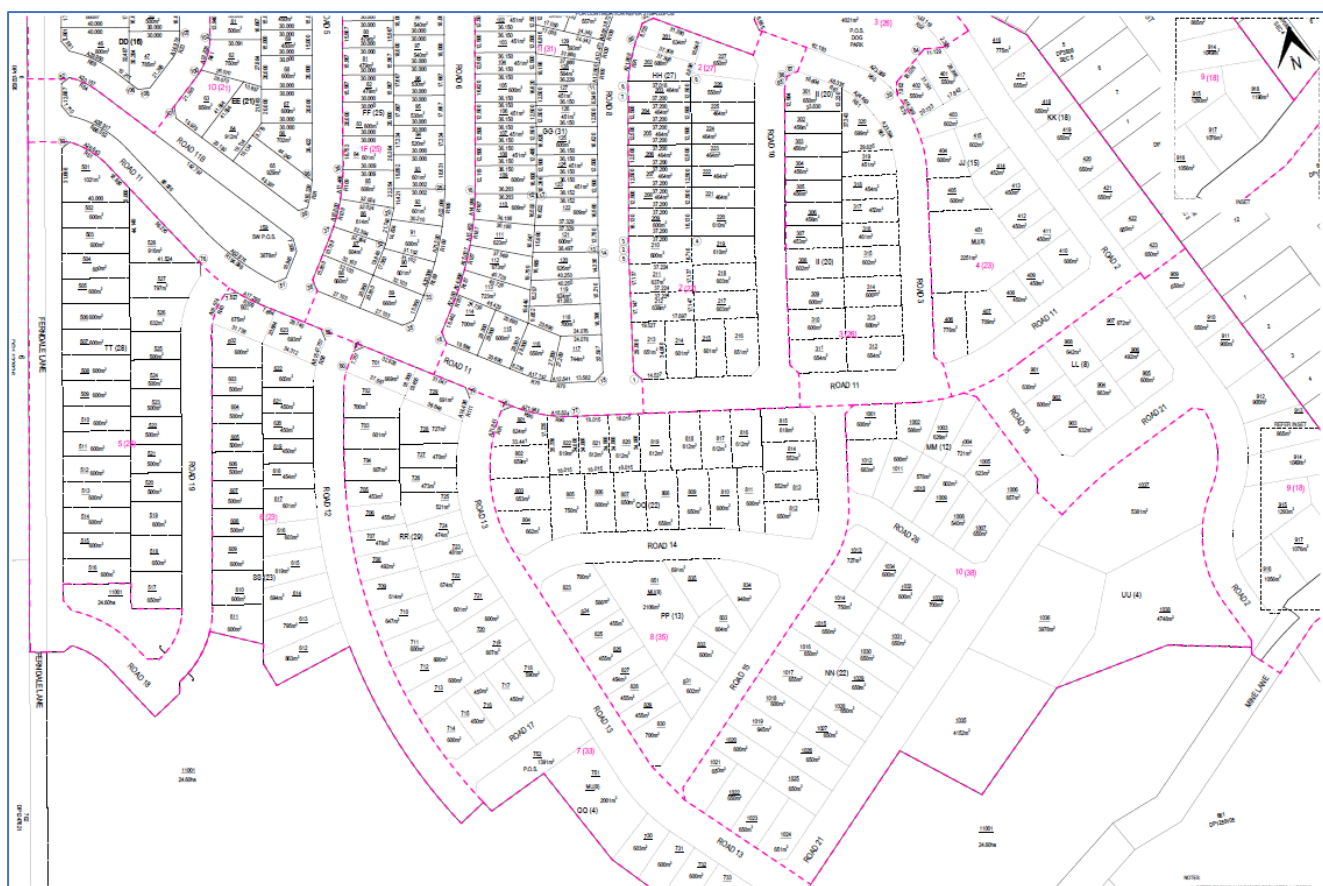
Stage 1 Proposed Plan of Subdivision - Sheet 2
